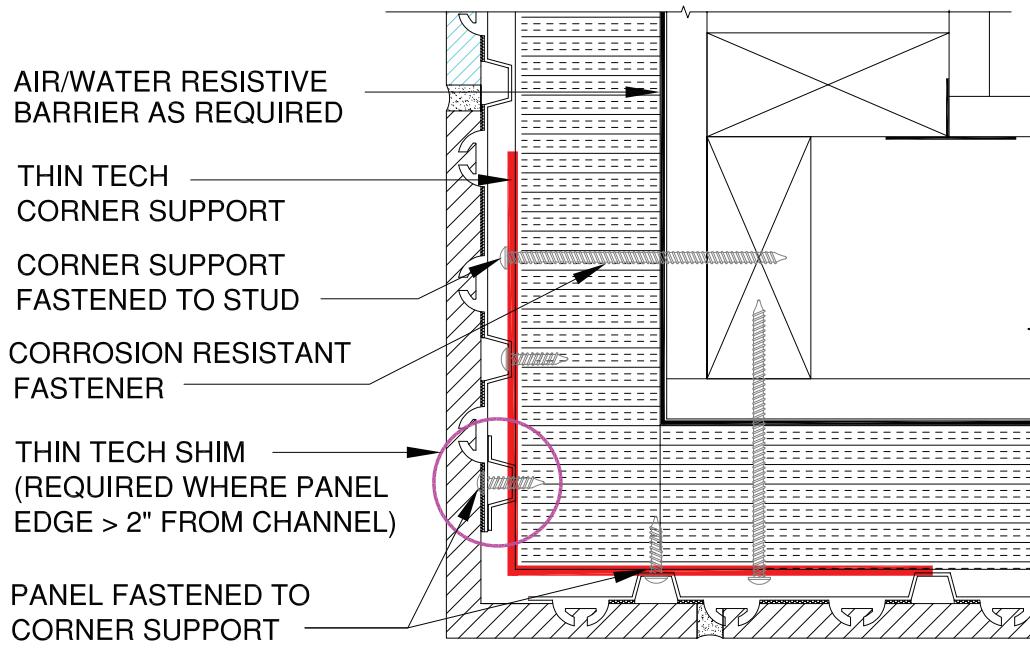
CORNER SUPPORT ATTACHMENT DETAIL
